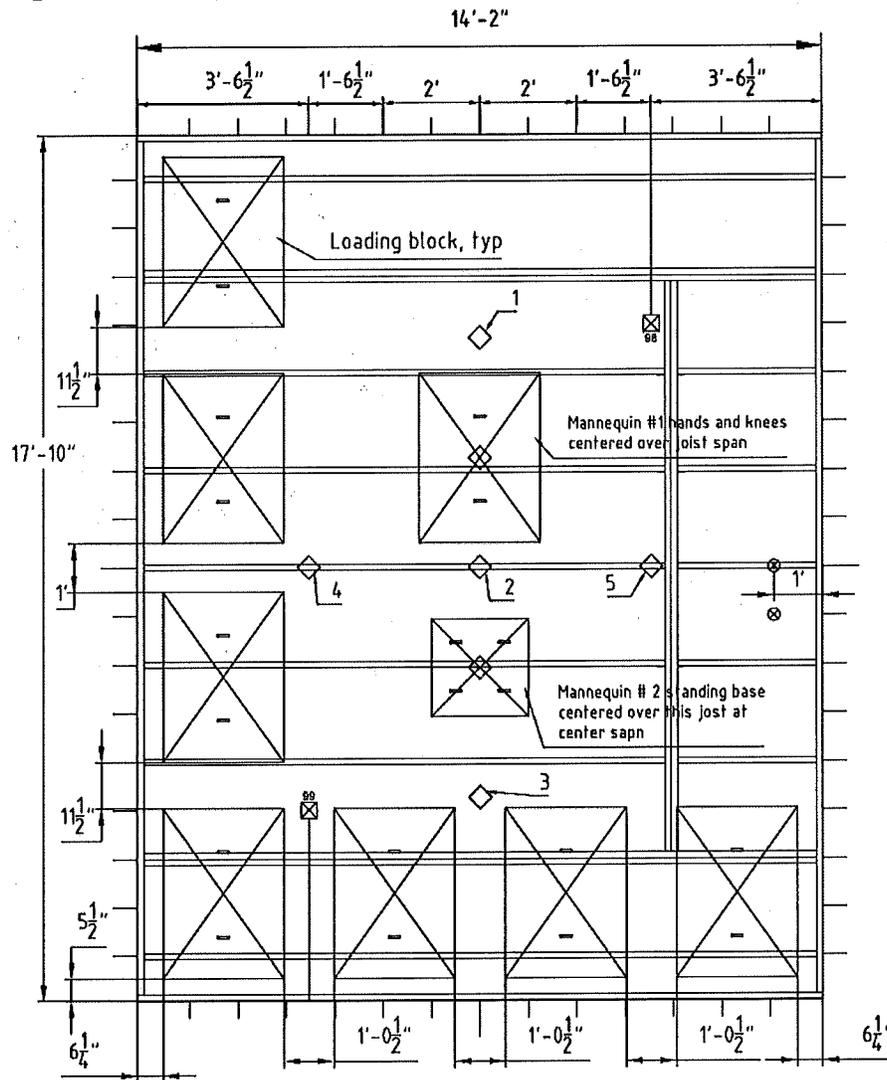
Loading and Instrumentation Layout (See Figure A.3.10).
